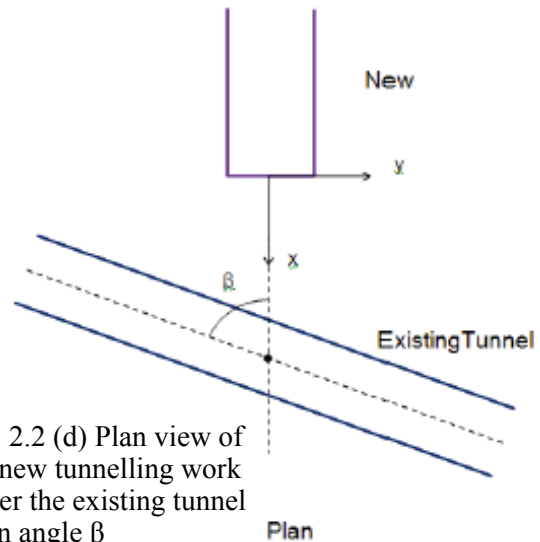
(d) Plan view of the new tunnelling work under the existing tunnel at an angle β
